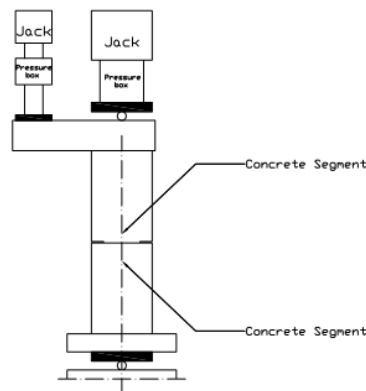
Layout of experimental test on flat concrete-concrete joint (*Hordijk and Gijsbers 1996*).
